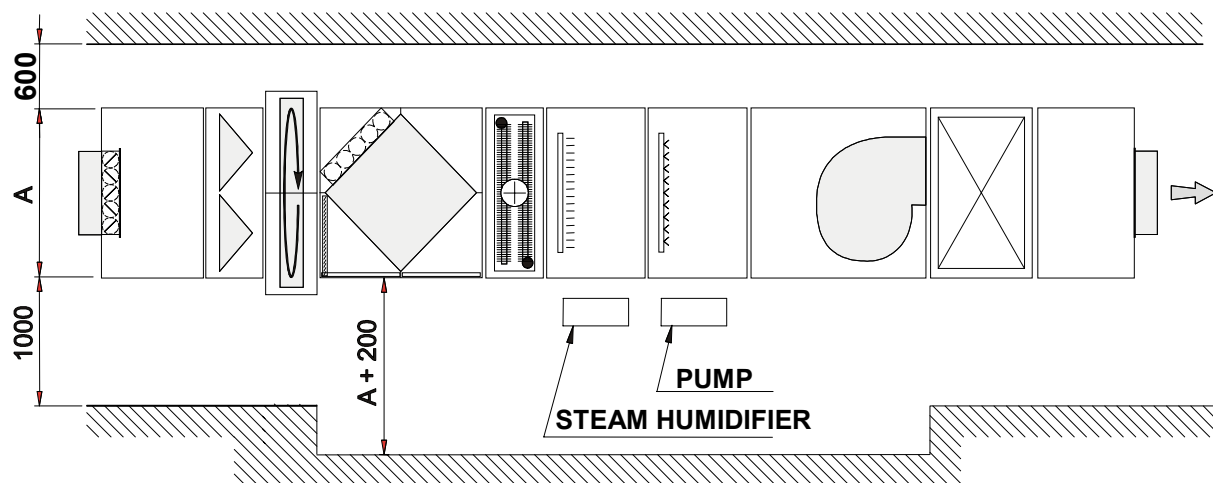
Minimum Mounting Clearance (top view, right hand maintenance side)
